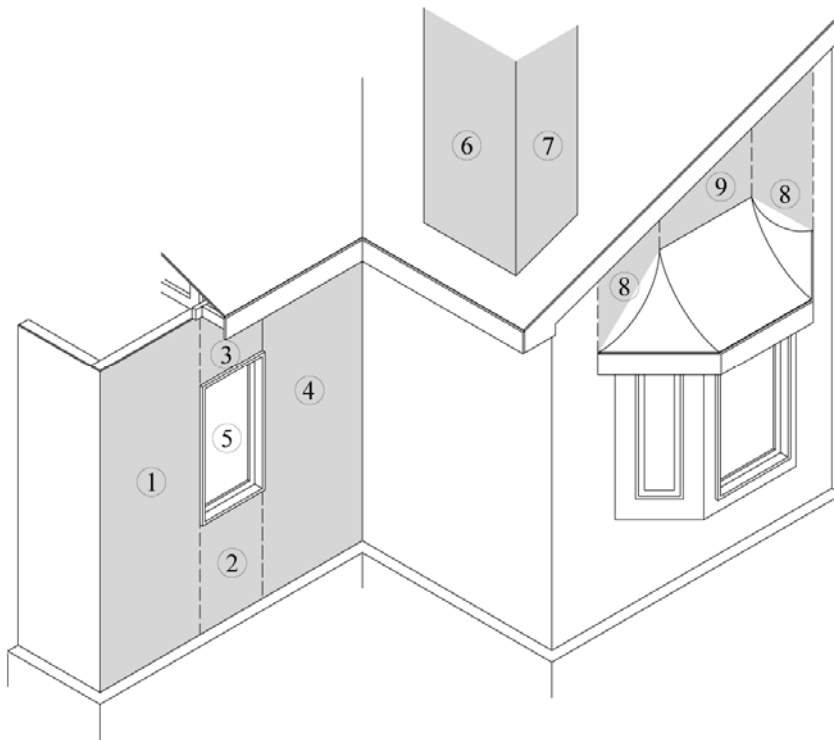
b.1 Flashing Locations in an Exterior Wall Assembly
